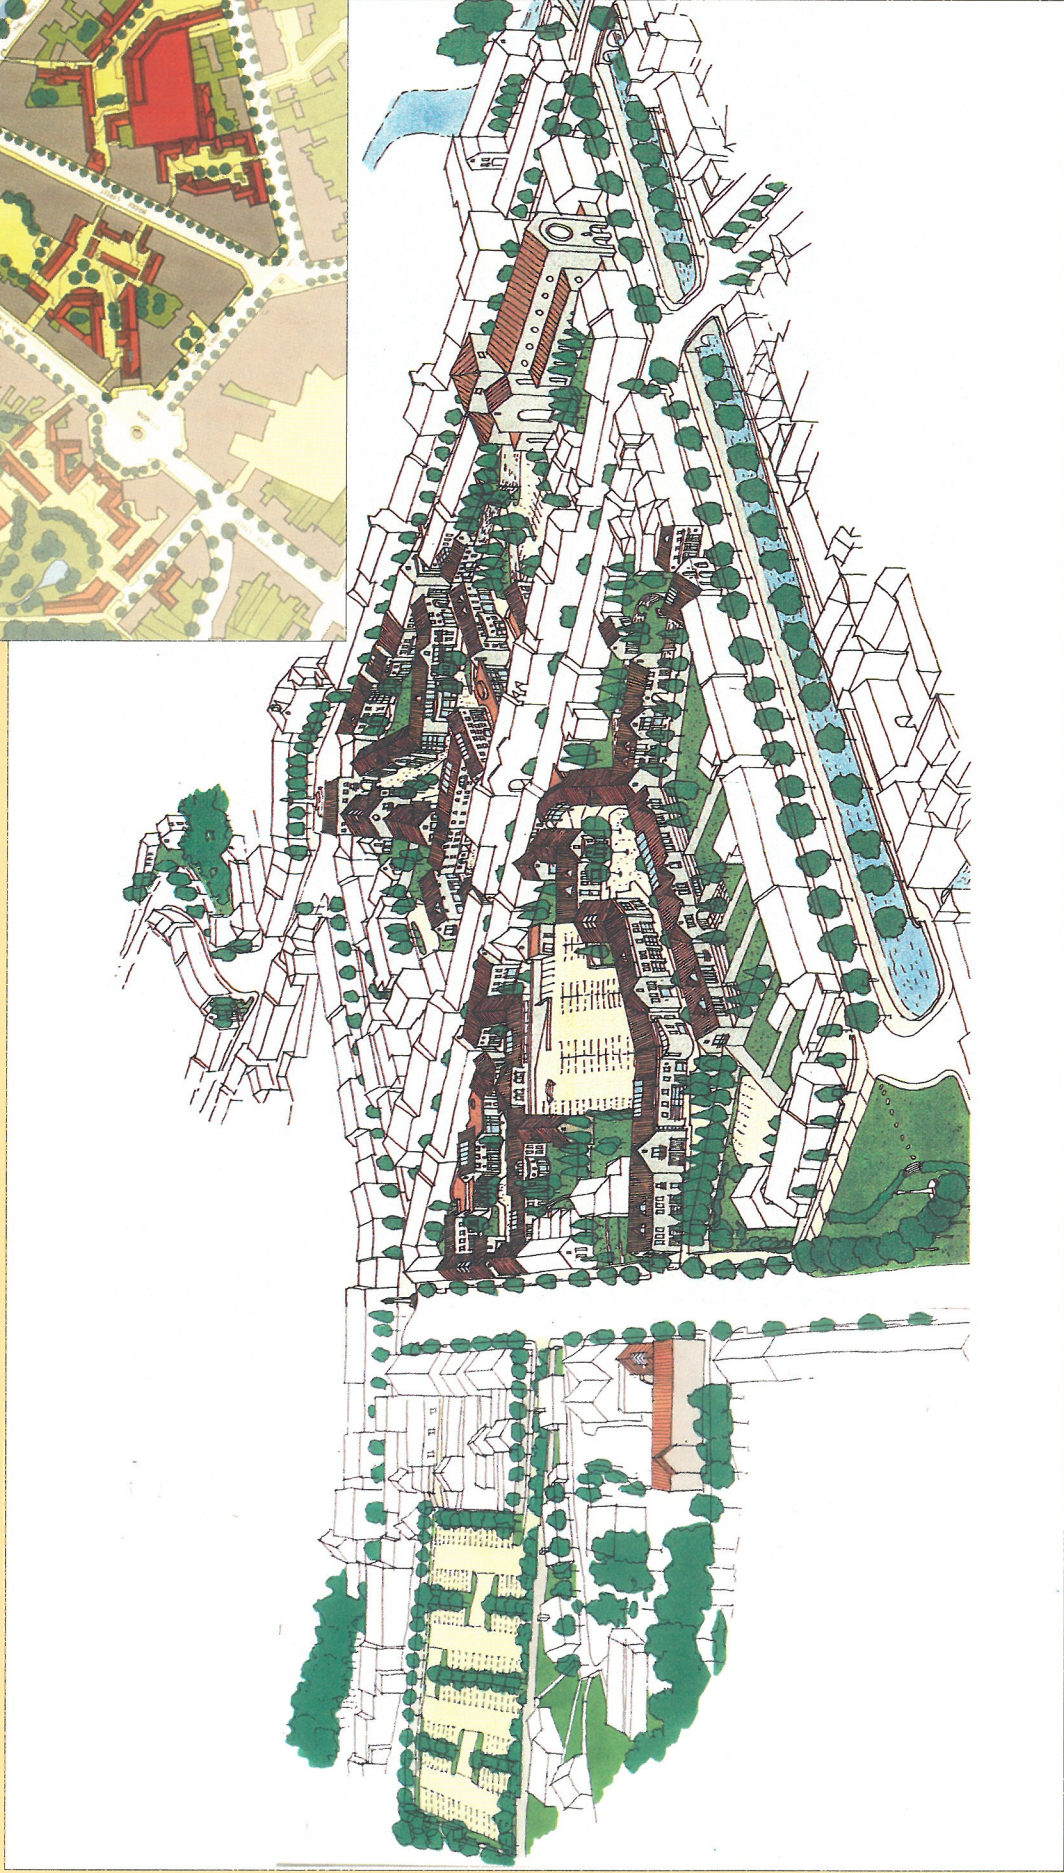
Perspective Sketch (2): Detail Action Plan (1)
